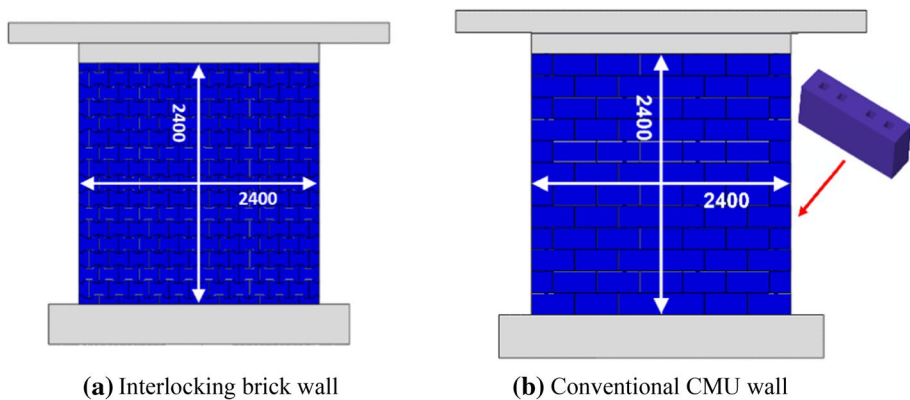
Full-scale models of the interlocking brick wall and the conventional CMU wall (unit: mm)
